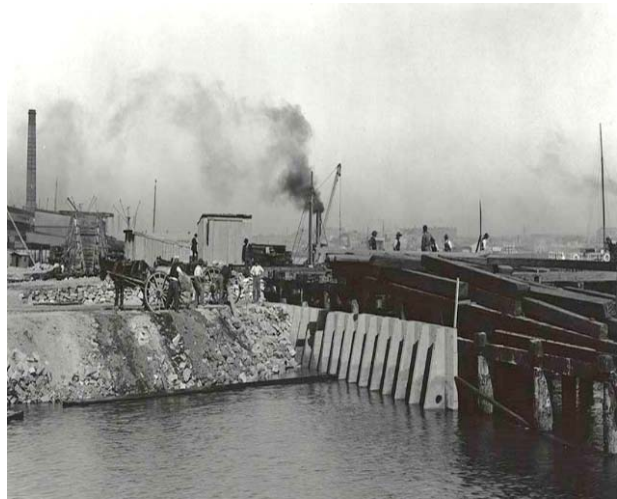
Example of Monier trestle seawall being constructed, Darling Harbour (n.d.).⁵²
